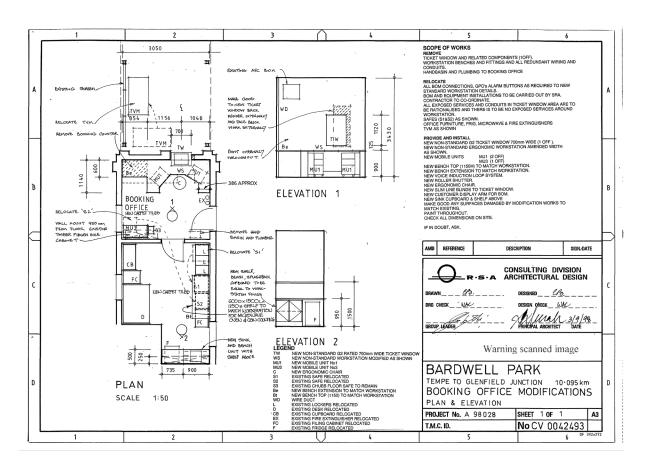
Alterations to Booking Office, 1998 (Virtual Plan Room).
